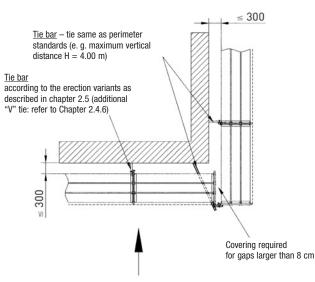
Corner construction through connecting the frame standards by means of tubes and standard couplers.
